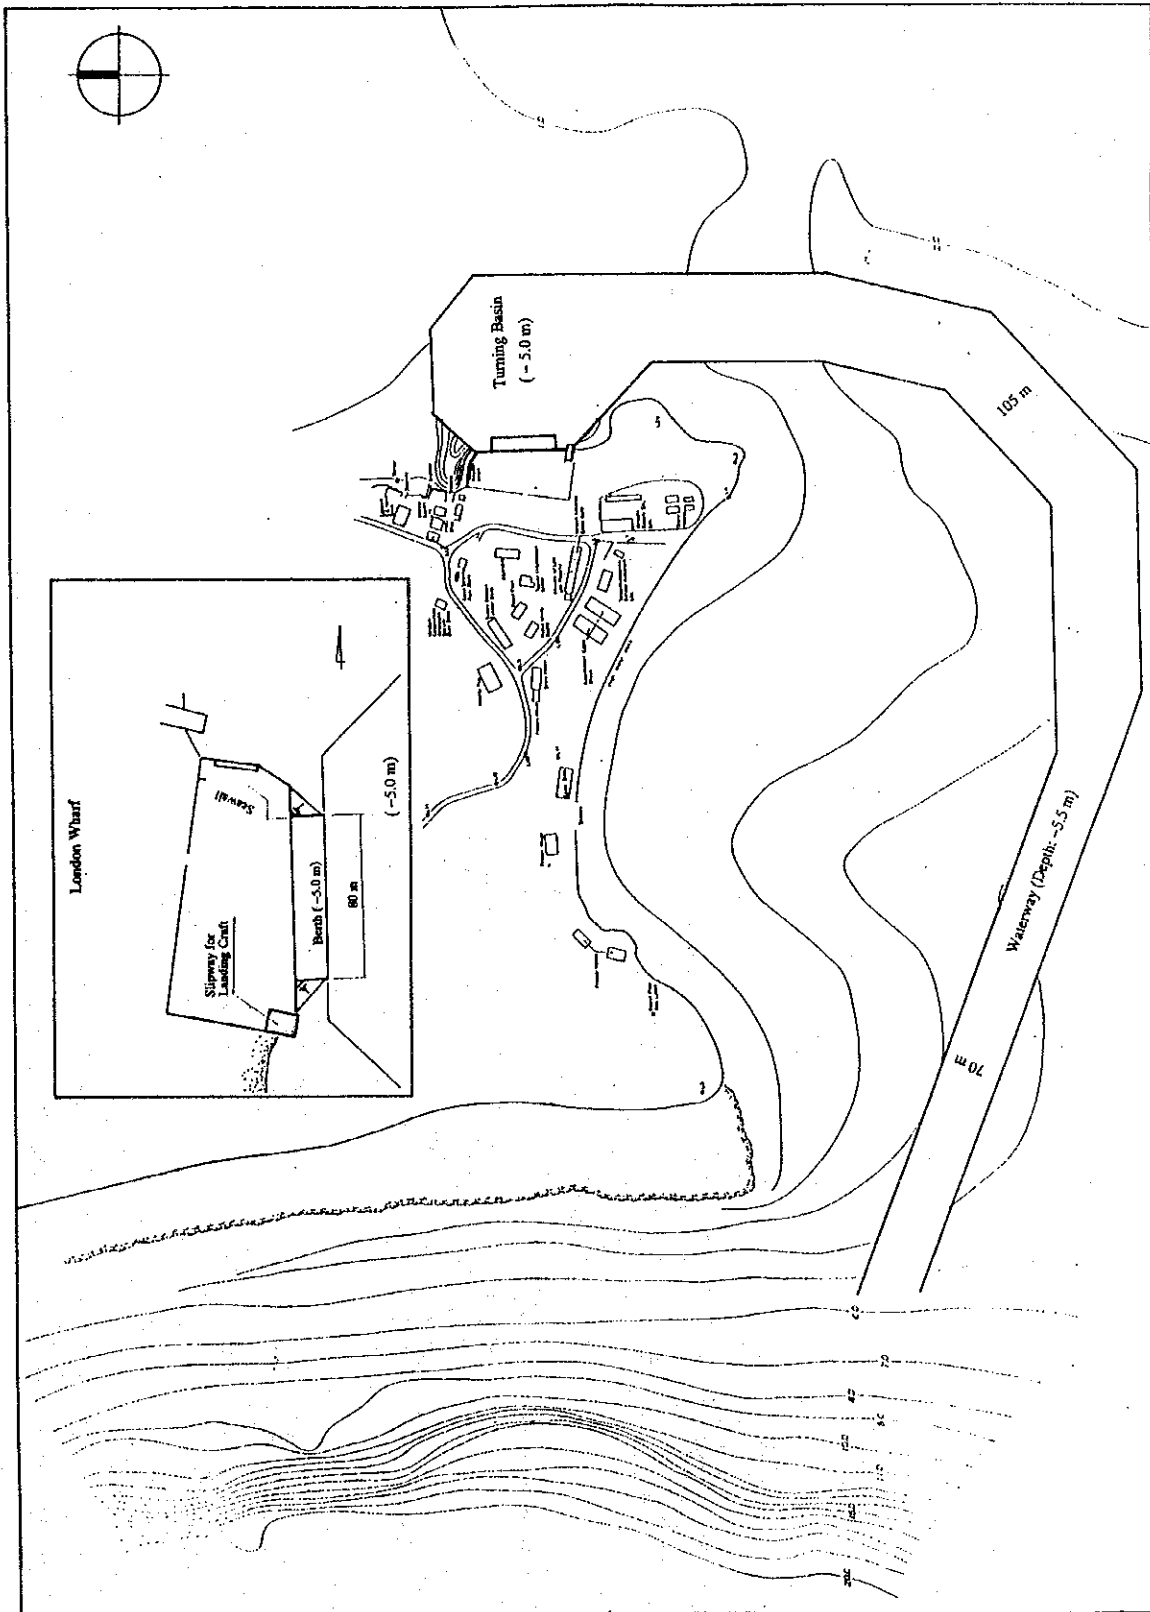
(1) Conceptual Development Plan of London Wharf, Alternative Plan 2
